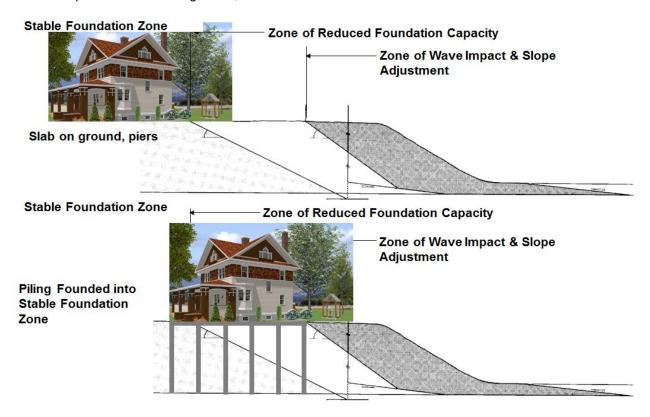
Use of deep piled foundations to guarantee future structural integrity of new development in areas subject to future shoreline recession.
